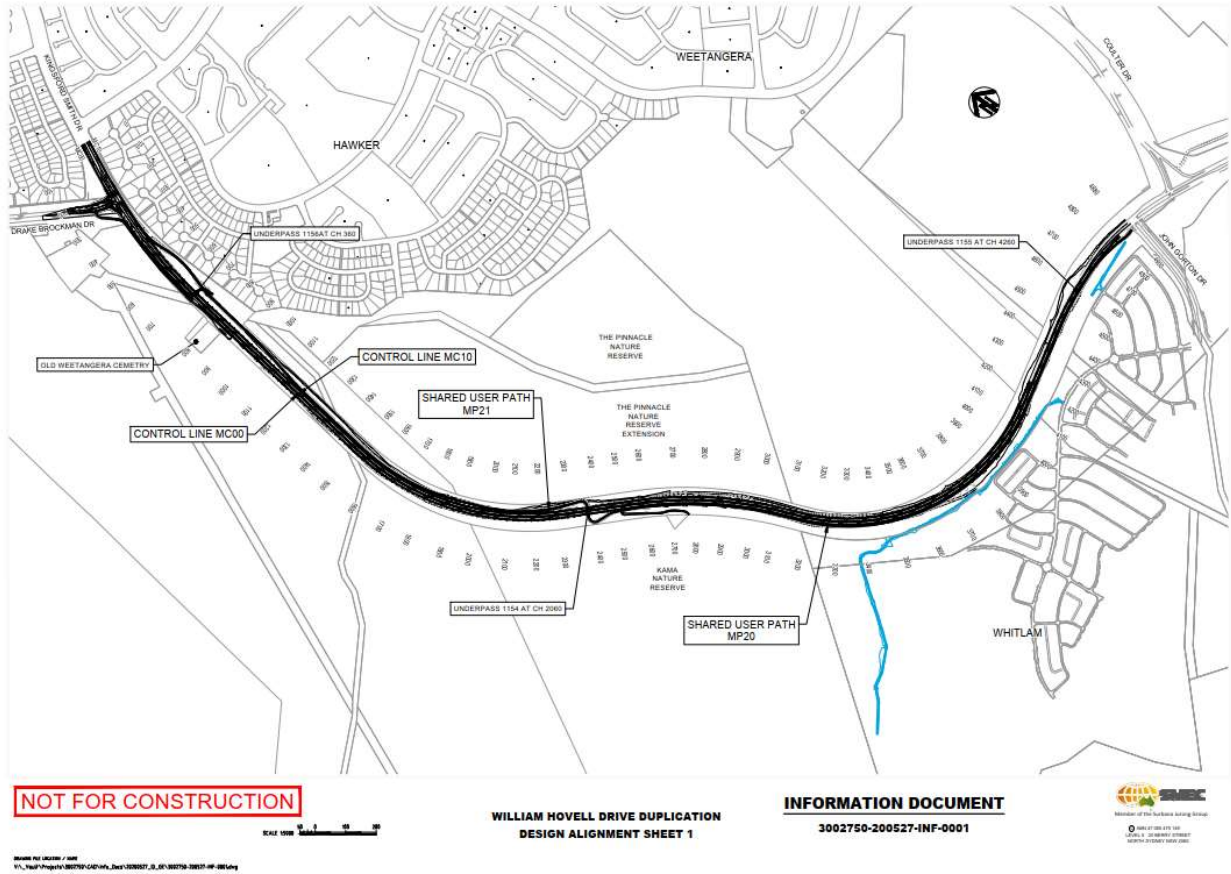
| General Overview of the William Hovell Drive Road Duplication Project
